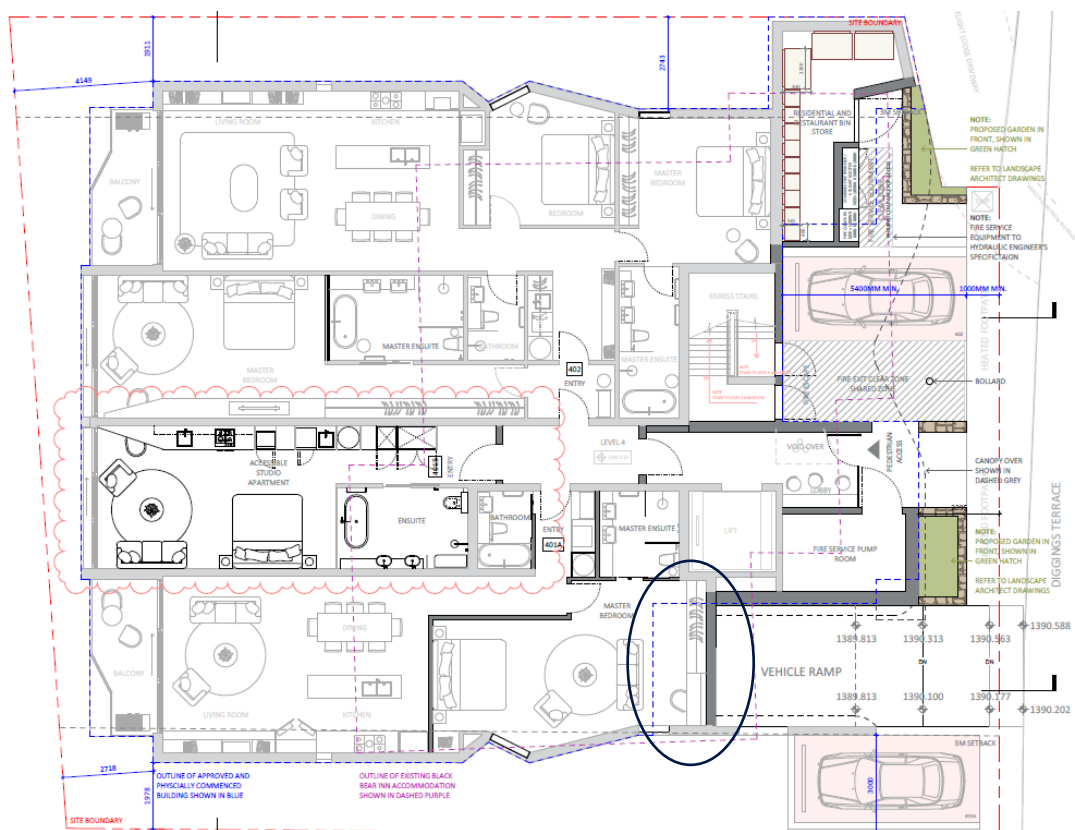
| Amended Level 4, with Apartment 401 bedroom area circled (Source: Applicant's documentation)
